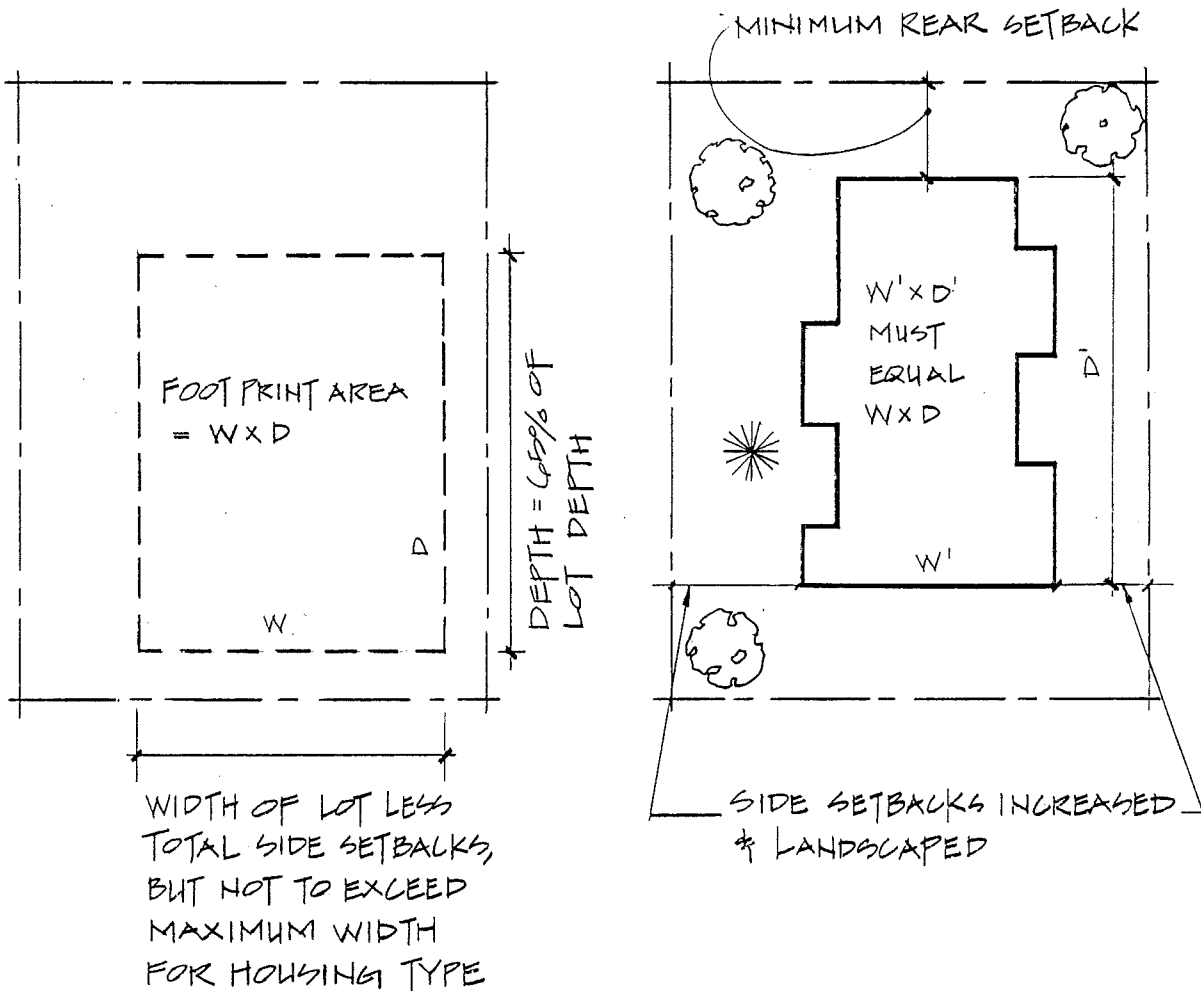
LOWRISE 2, STRUCTURE DEPTH EXCEPTION
